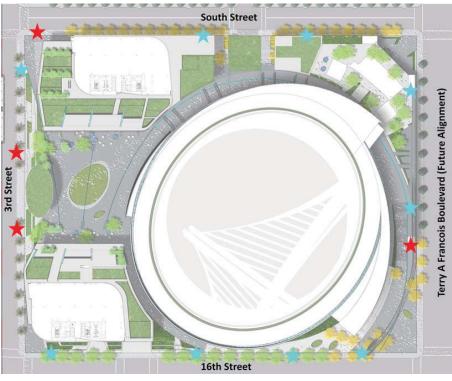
| Trash Receptacles (Mission Bay Streetscape Master Plan)
